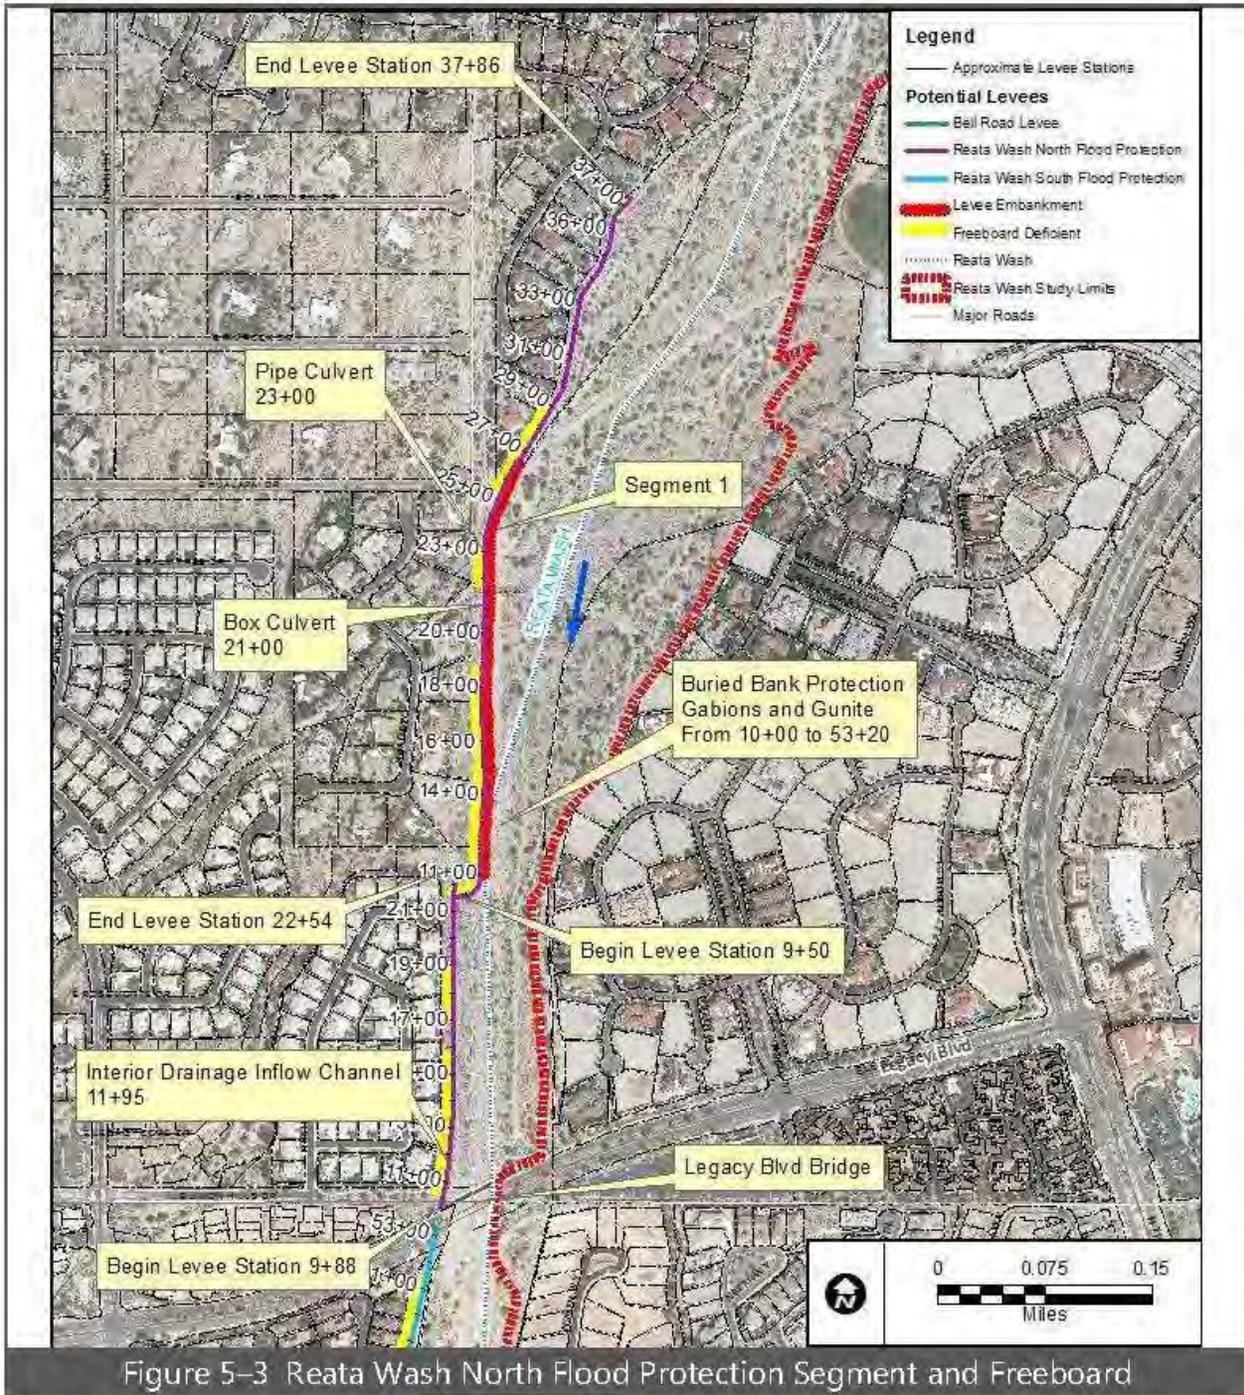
Reata Wash North Flood Protection Segment and Freeboard
